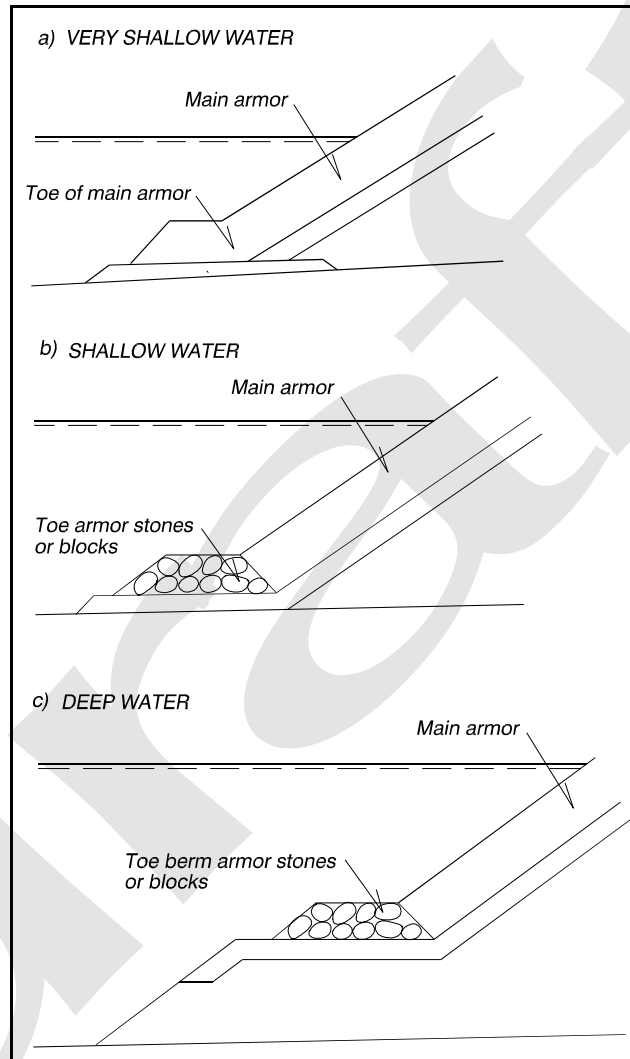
Typical toe and toe berm solutions in rubble-mound breakwater design
